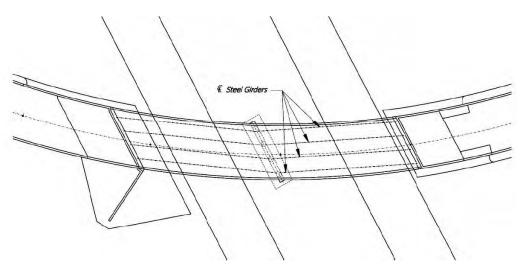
Plan view of a curved bridge with piecewise straight girders.
